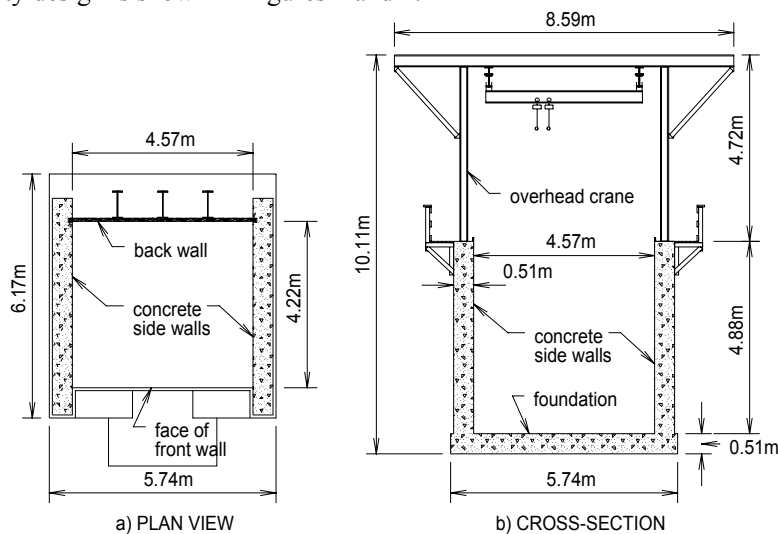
Plan and cross-section of full-scale retaining wall test facility.
